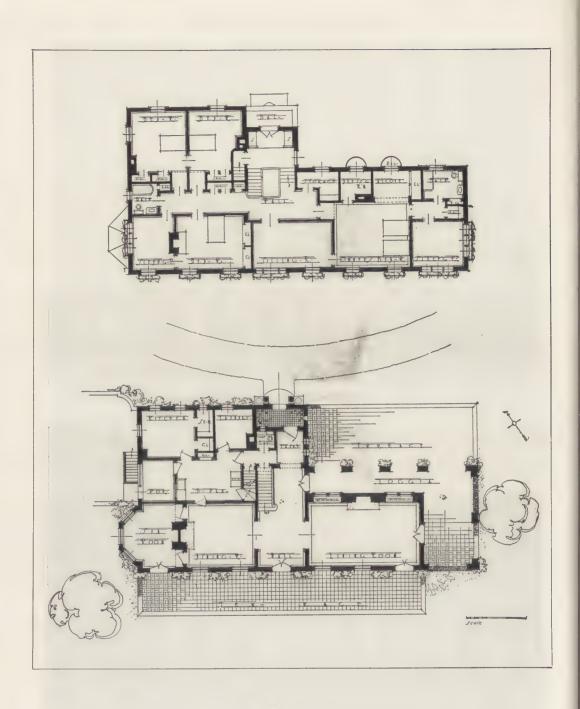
FIRST AND SECOND FLOOR PLANS—HOUSE OF C. A. GODING, NASHVILLE, TENN. E. E. DOUGHERTY AND T. W. GARDNER, ARCHITECTS.
